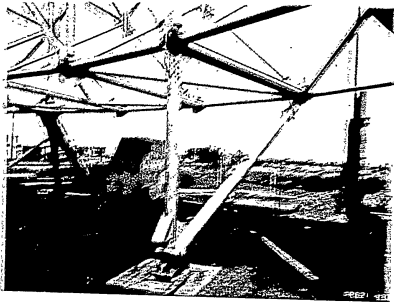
Front support leg bolted in place, showing some fitting and bolting. Rear support leg in background beyond another test mount.
